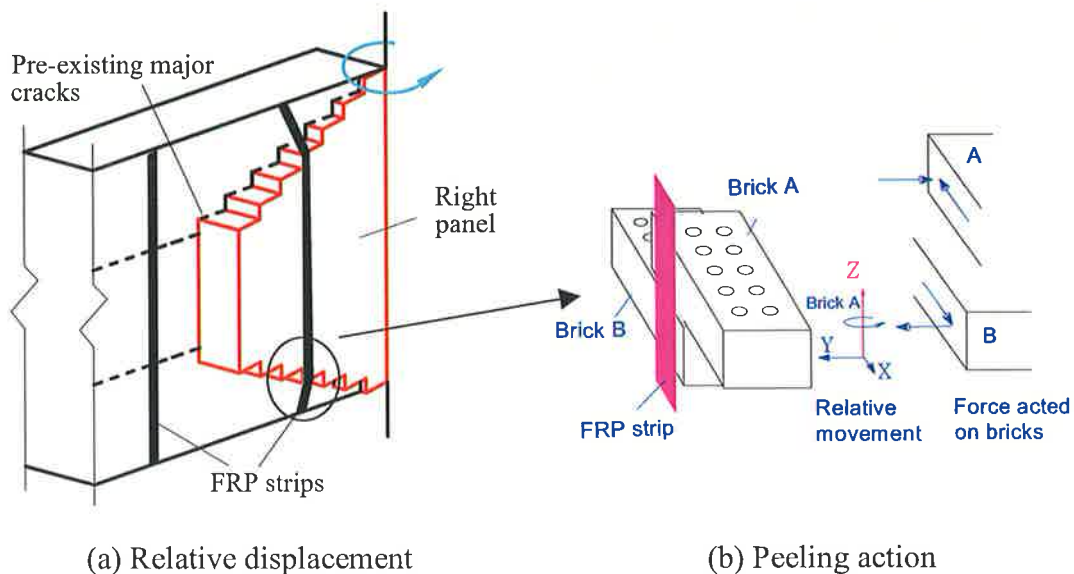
Schematic of the peeling debonding failure mode for Wall 1
